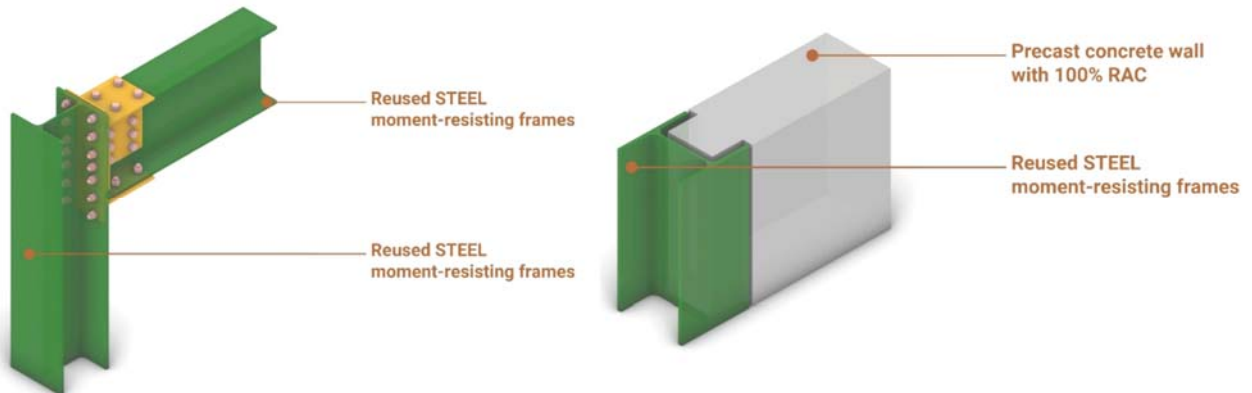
Steel frame connection between column and beam (left) and initial detail of wall-steel column connection (right)
